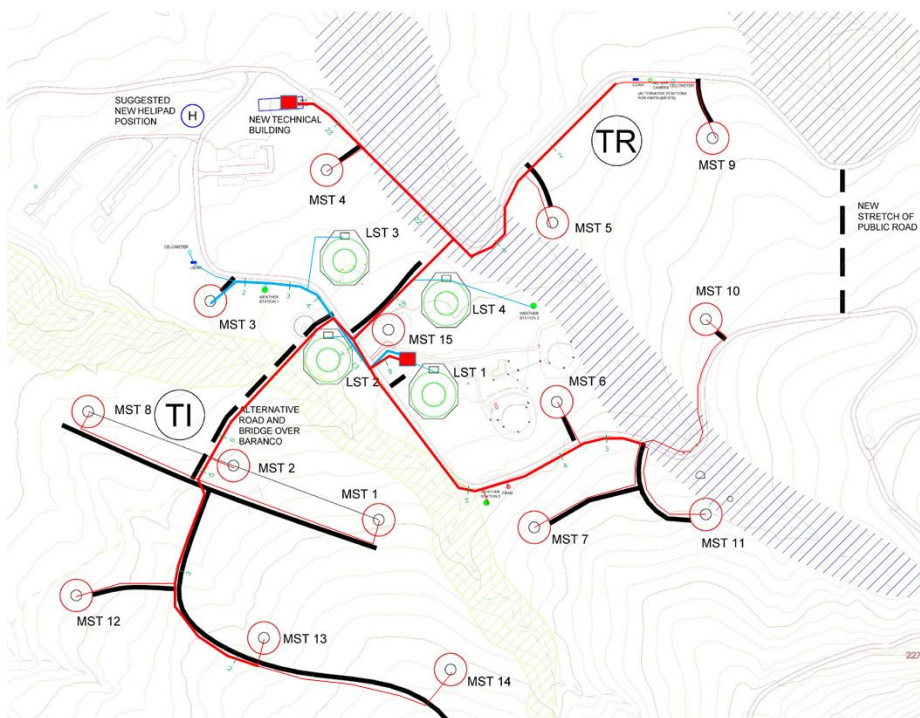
Network Array Topology for final layout (Expansion 2) (Alternative road over barranco to be changed) to be updated
